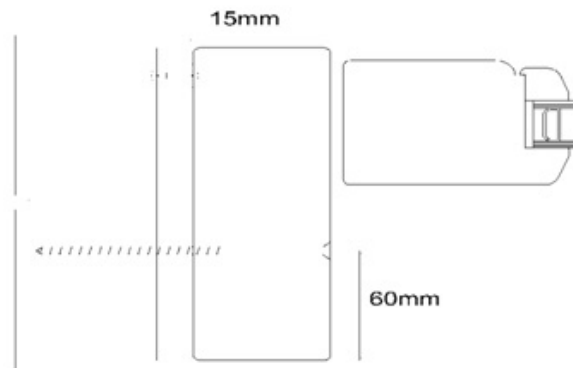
Fastening of a jamb of a parallel sliding door (vertical)
